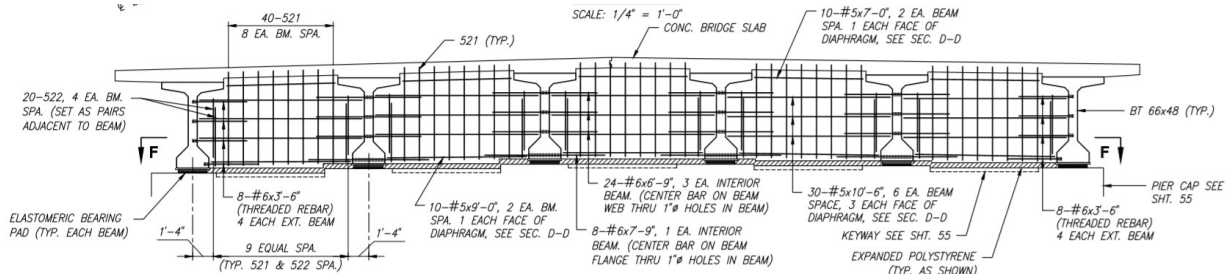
Transverse Elevation of Pier 2 Diaphragms (NBI 5941) (2014)
